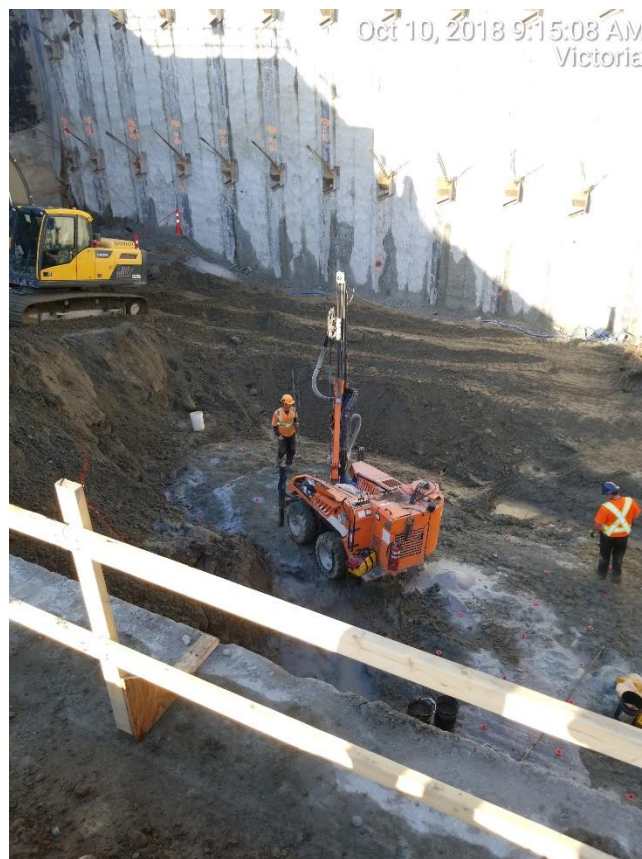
Clover Point Pump Station: Drilling rock in wet well area.
